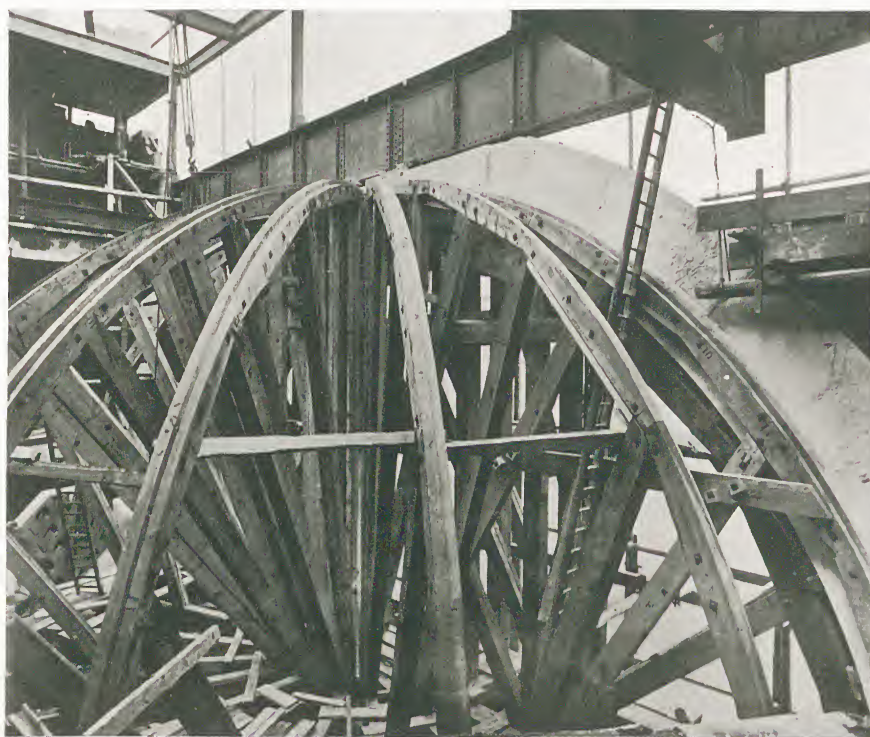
CENTERING FOR THE SUPPORT OF THE STONEWORK OF CEILING,
